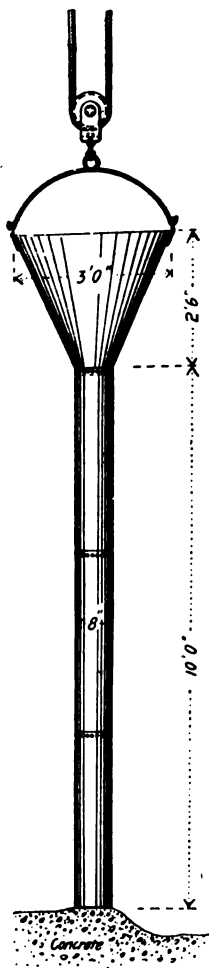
Tremie or Tube for Depositing Concrete Under Water.
